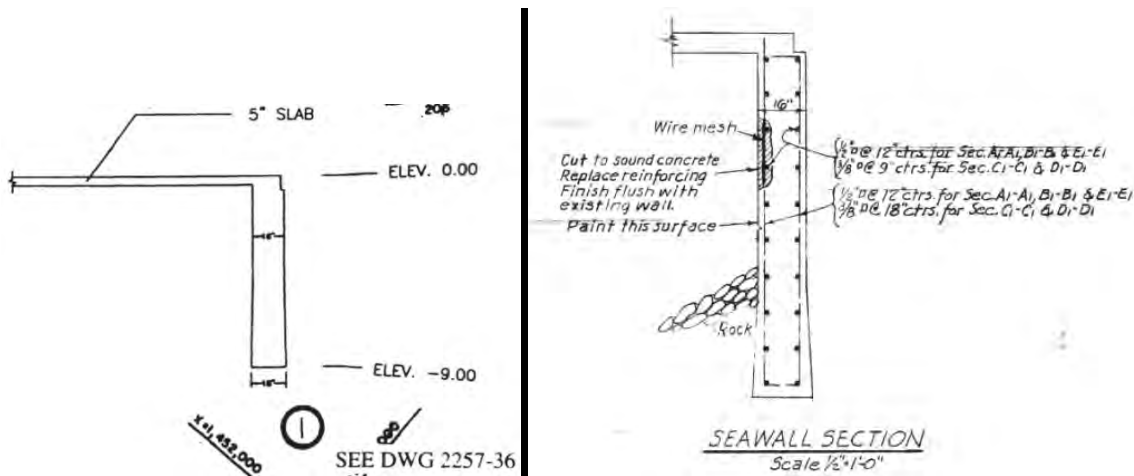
Seawall Section 3, Bulkhead Wall Type 1
